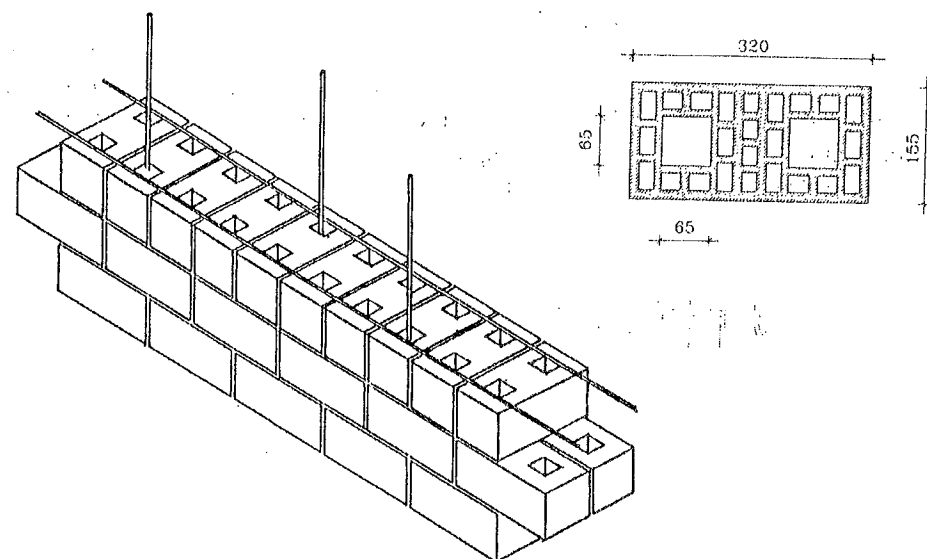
Clay unit and form of reinforced masonry construction developed in Greece
